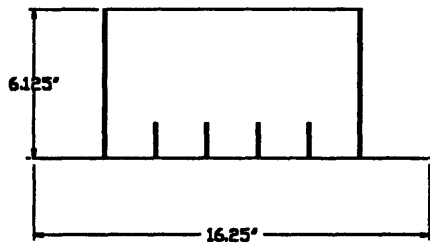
Narrow Transversely Stiffened Specimen Construction Drawing
